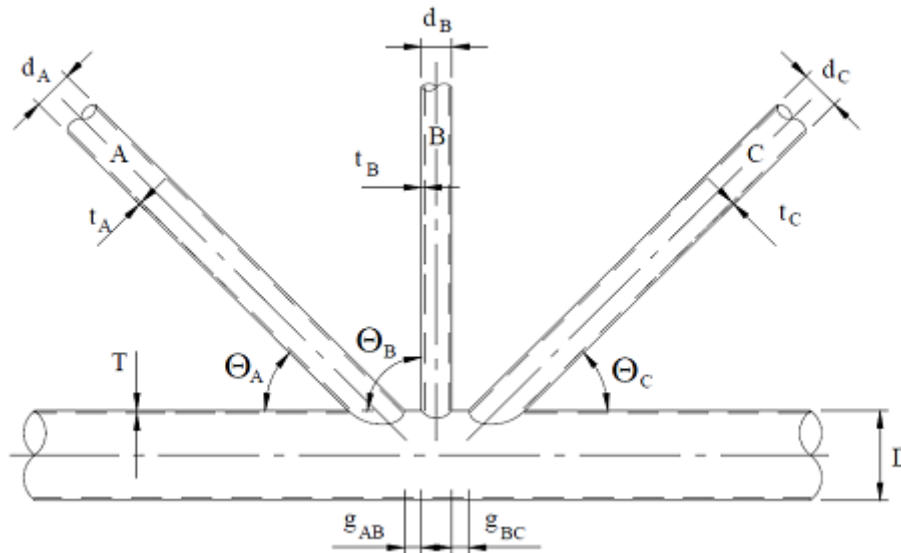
Definition of non-dimensional geometrical parameters of tubular joint 13
